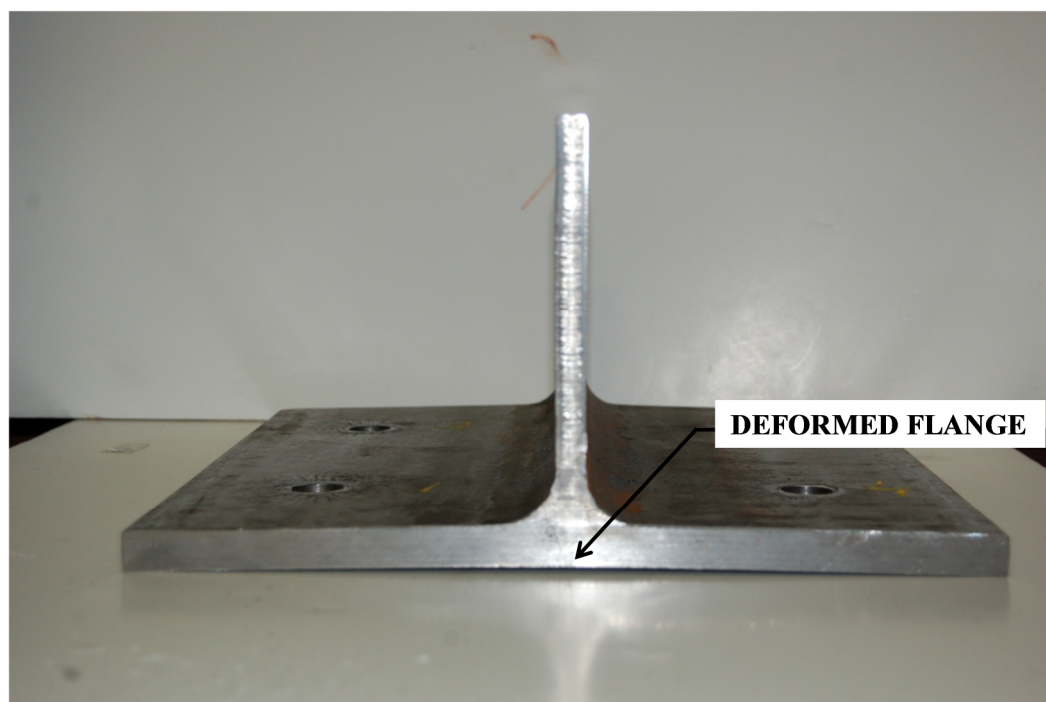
Deformed Shape for Specimen 2.0b Post-Testing.
